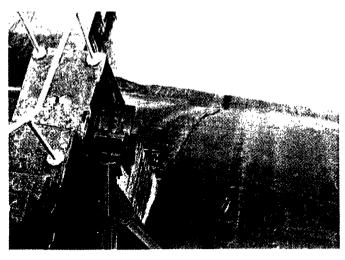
Loosened Rock Block at Downstream Base of West Bulkhead
